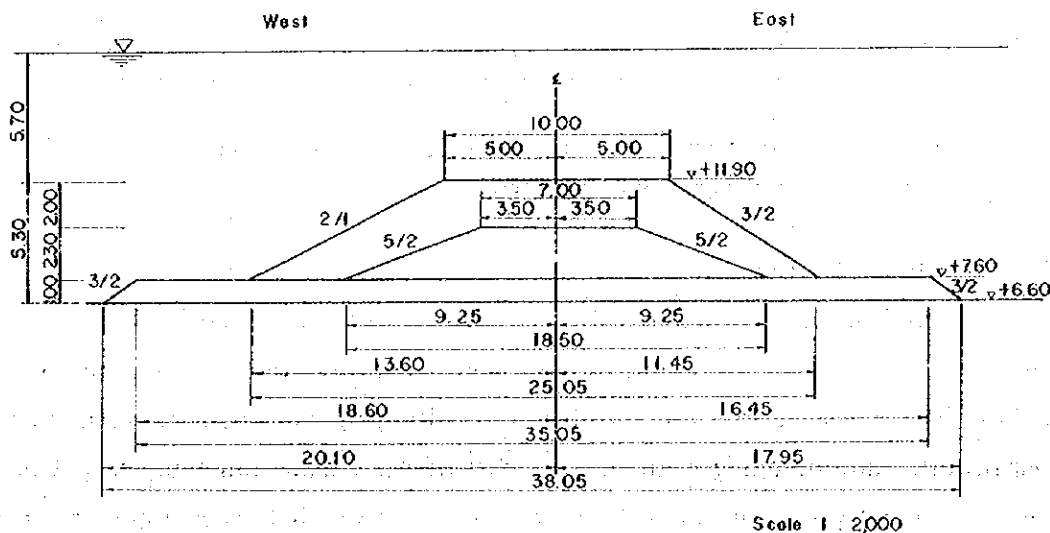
Port Said West Breakwater (Design Cross-section of Extended Submerged Section)
